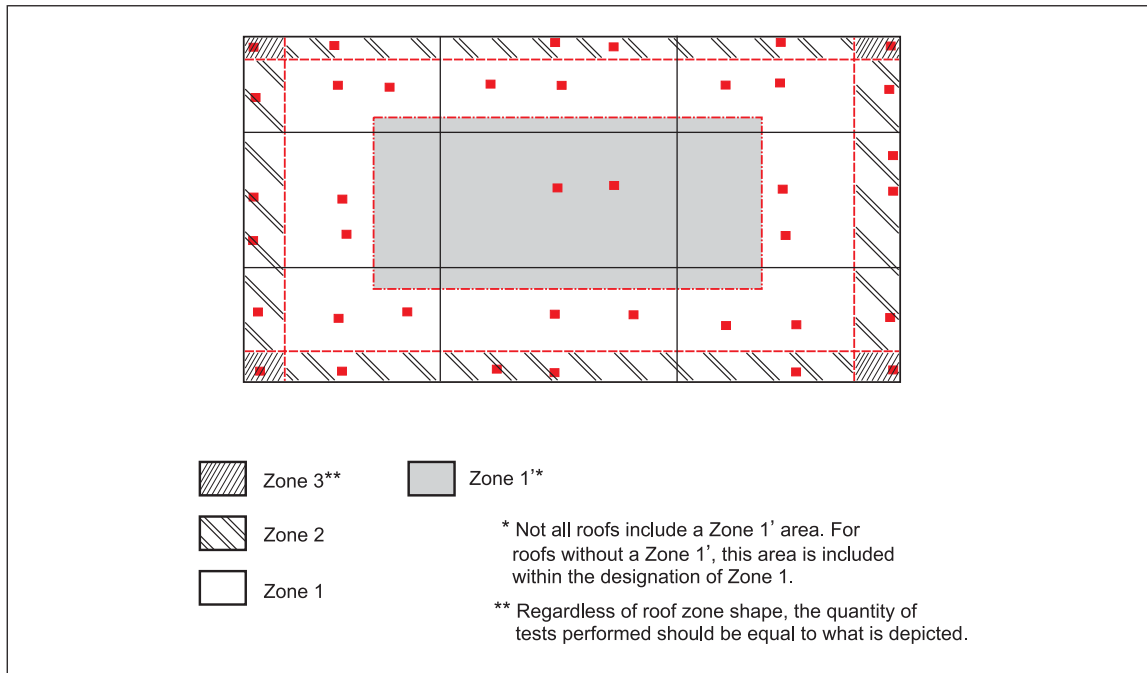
Uplift test location example: Nine sections A_i with individual roof areas up to 60,000 ft^2 (5,600 m^2) and no change in above-deck roofing assembly for Zones 1 and 1
